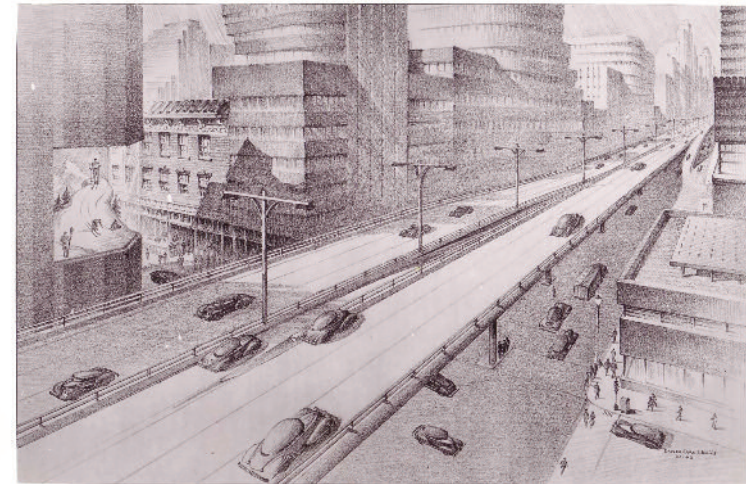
Plate VIII.—An elevated section of the interregional system as it might be built according to the standards proposed, with central exit ramps and lateral entrance ramps. The sketch suggests the manner in which new properties might conform to curving lines of the expressway in widened sections at access points, and a show window at the elevated level dressed appropriately with the kind of large display that would be needed for comprehension by express traffic.
